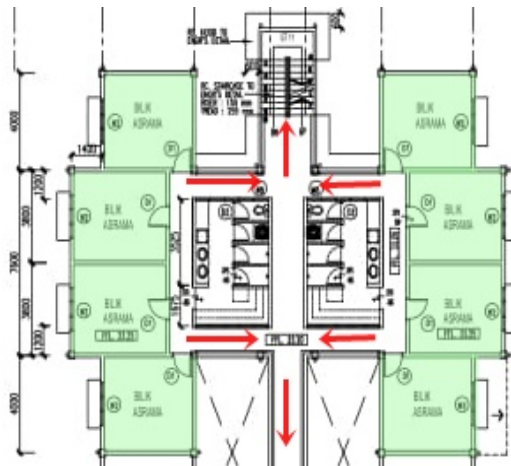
Shows floor plan of the interior corridor of the resident's room at Desasiswa Saujana (M04)
